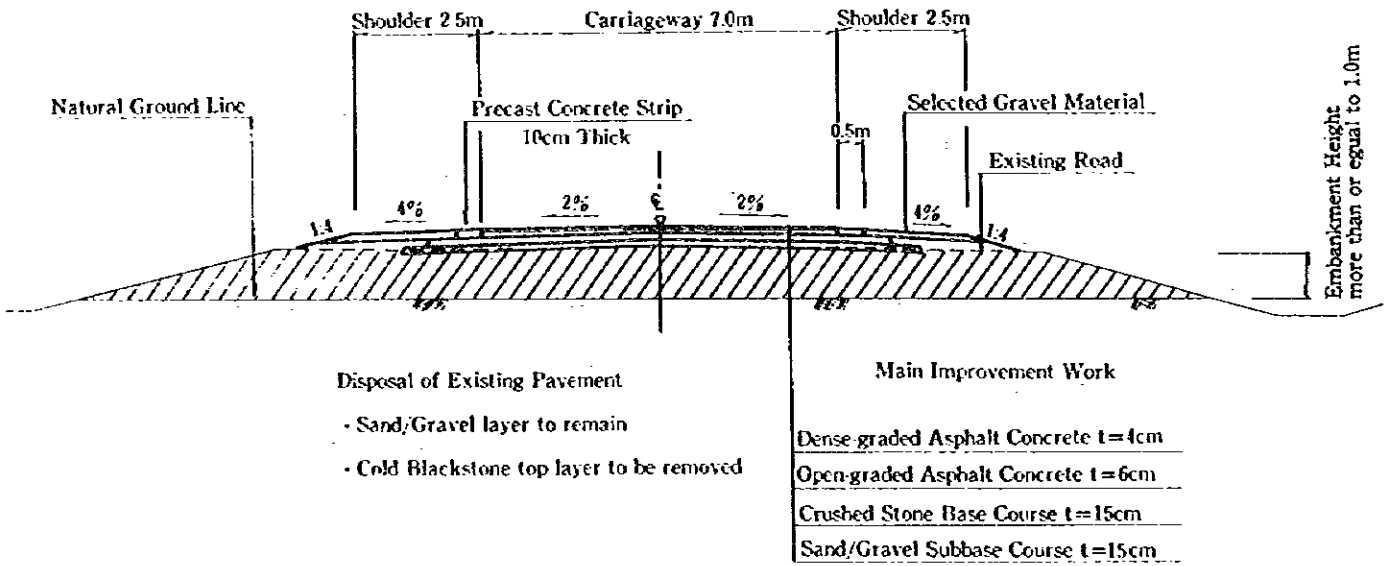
(5) : Cross-Section of Road for Type-IV Improvement
